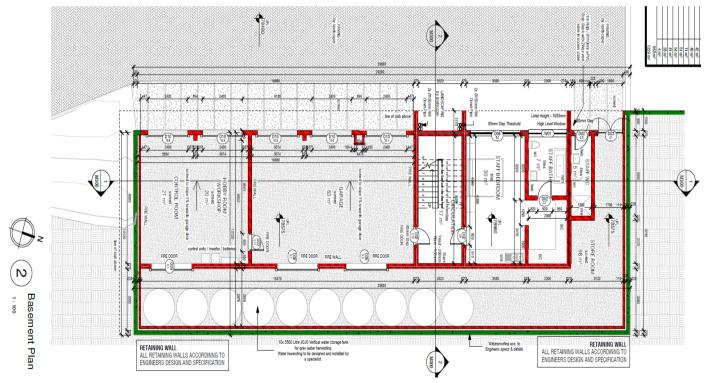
Basement Plan (Mathews + associate architects, 2023)
